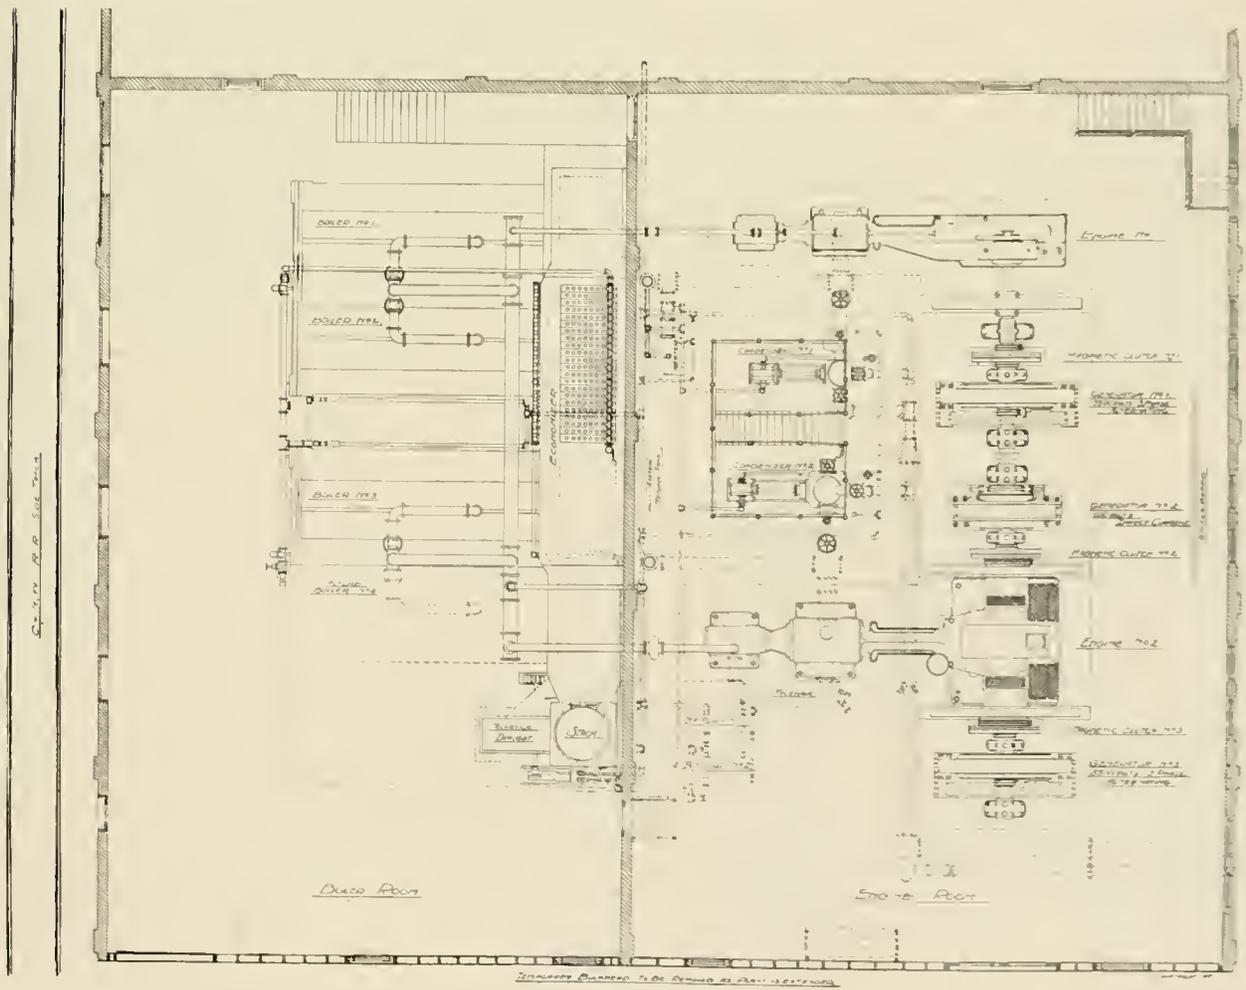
PLAN OF POWER STATION AT HIGHWOOD.
